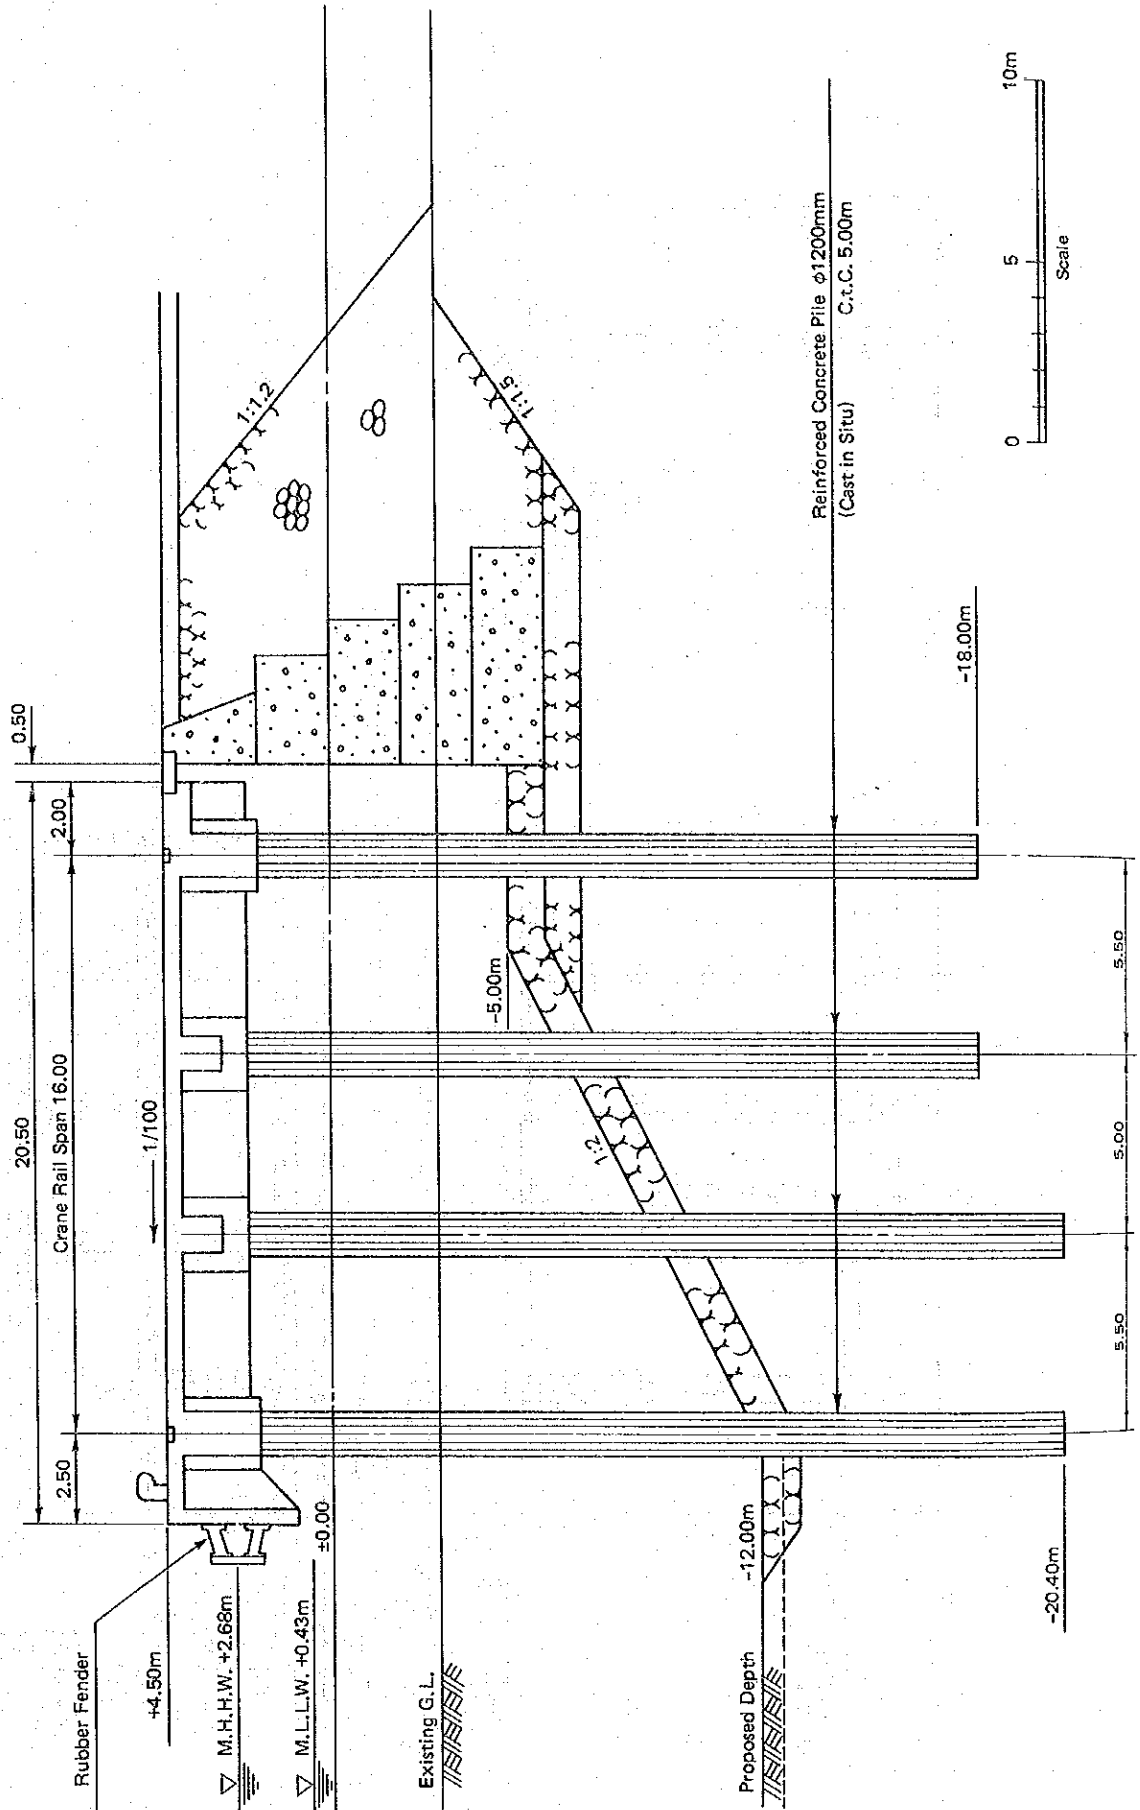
Karachi Port Container Berth Cast in situ RC Pile Supported Type Platform Plan
